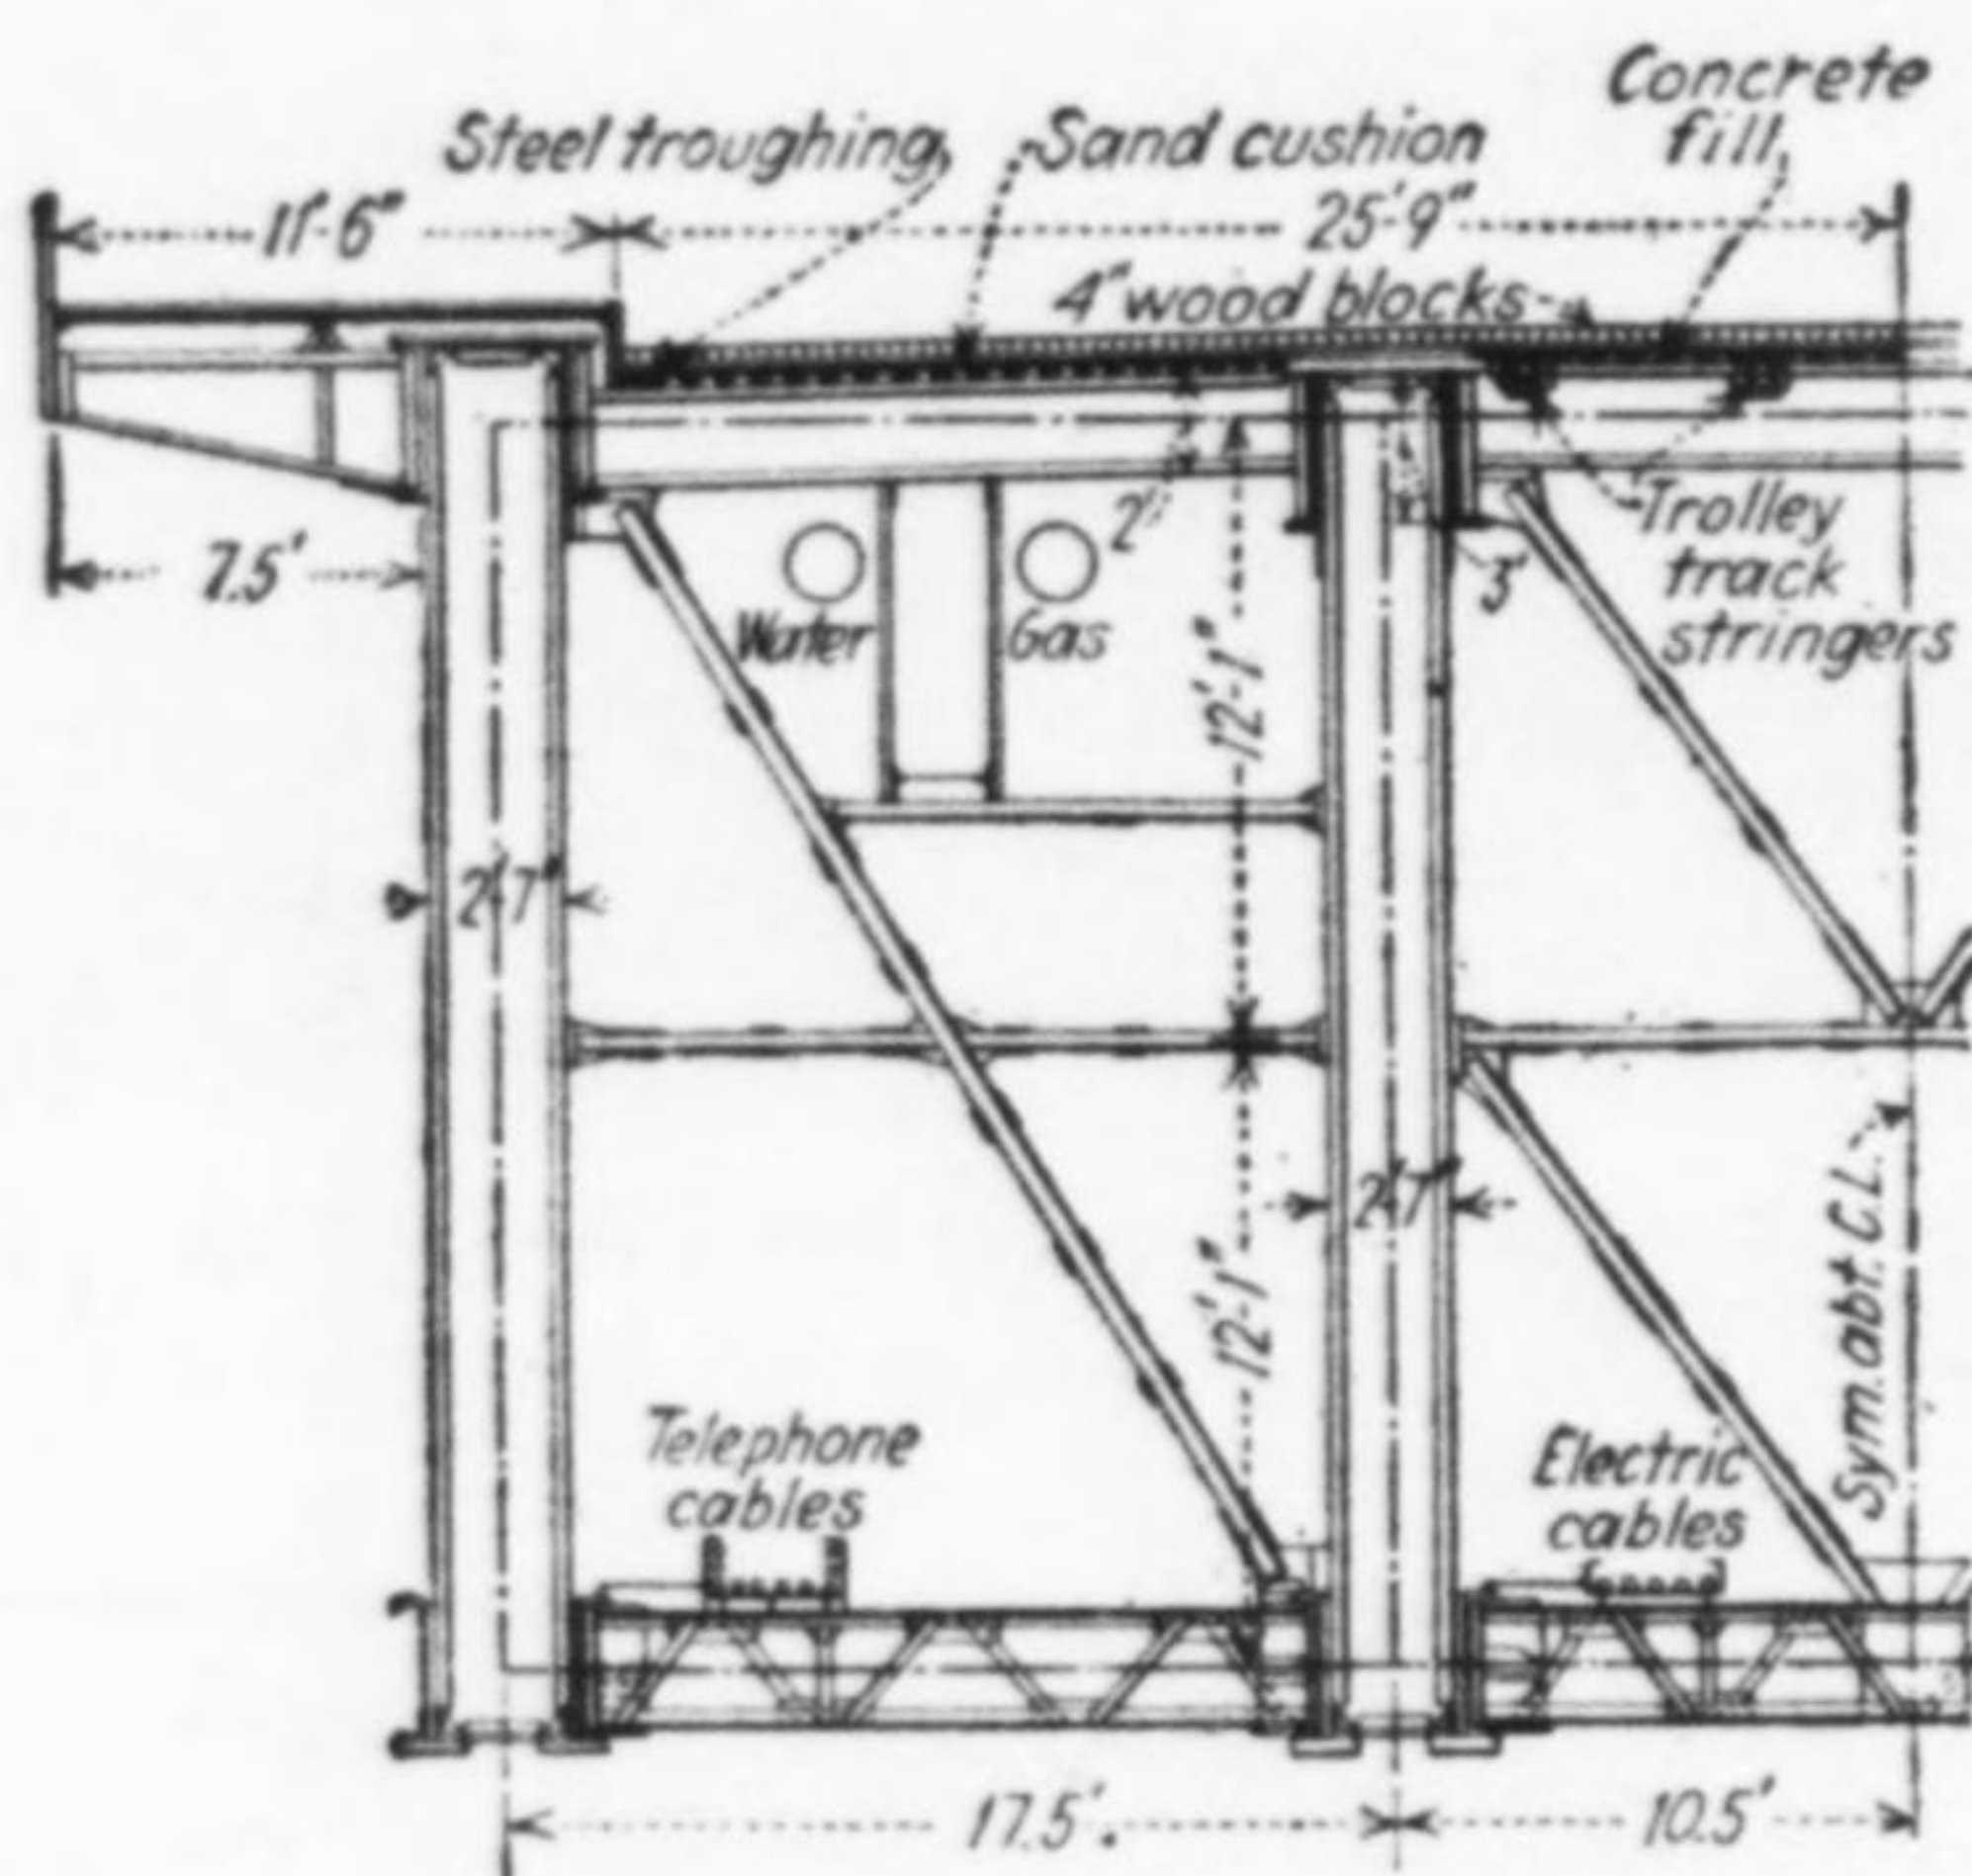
FOUR TRUSSES with substantial sway bracing comprise the main structure. The deck consists of concrete-filled steel troughs and wood blocks.
